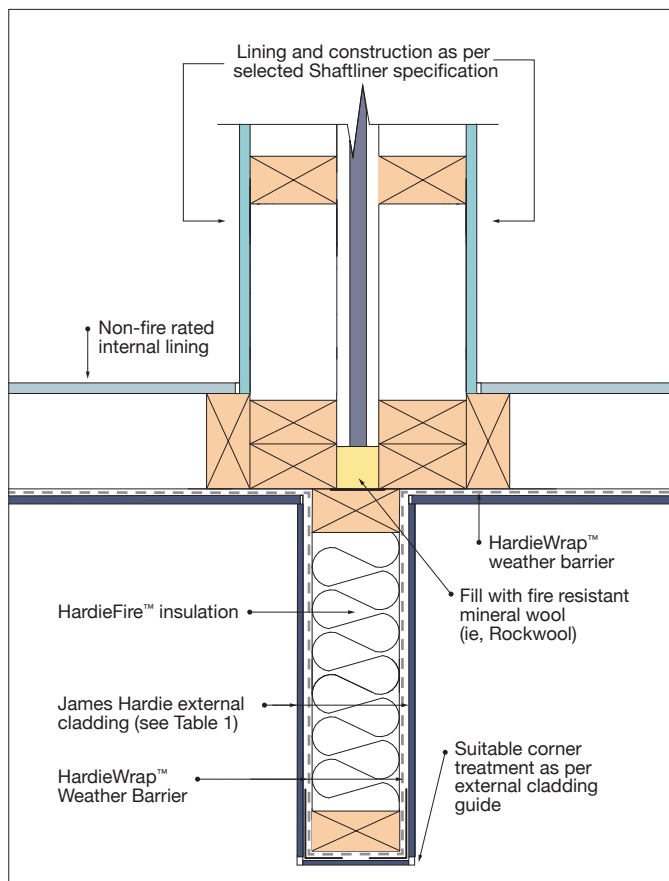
HARDIESMART™ WALL JUNCTION WITH TYPICAL SHAFTLINER SYSTEM
